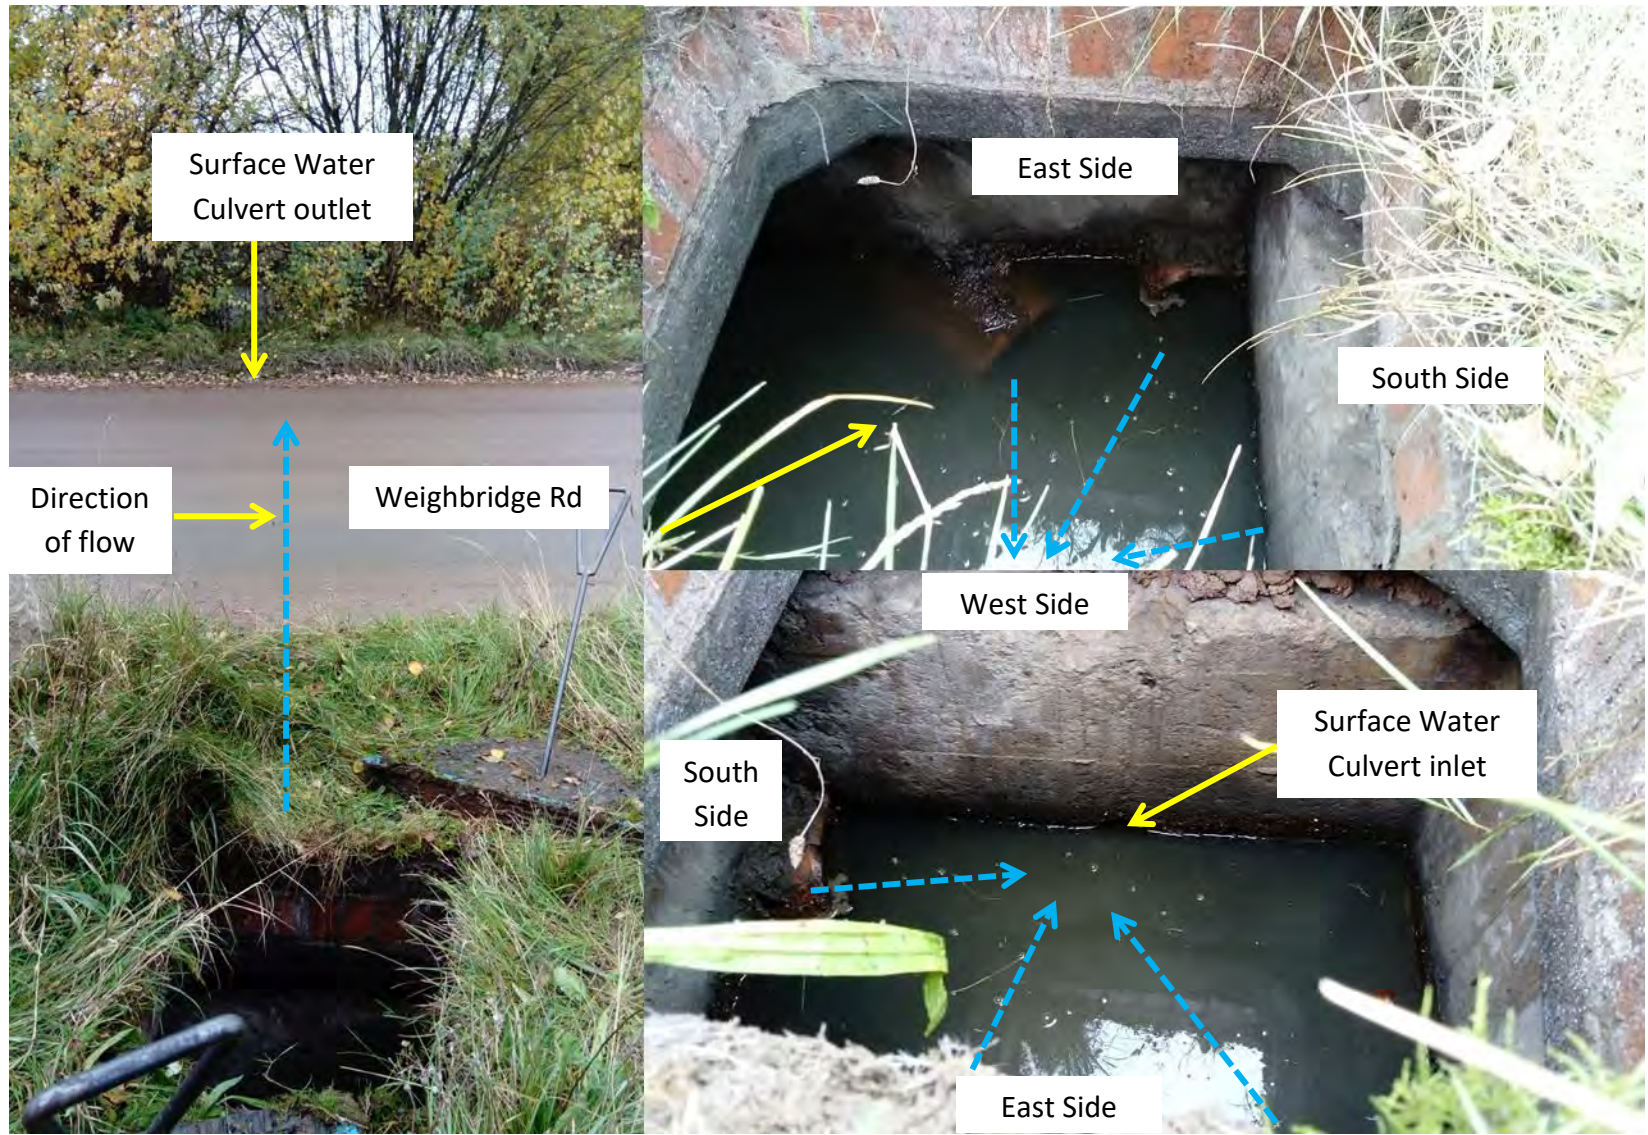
Surface water drainage in adjacent to site access ramp. Manhole receiving surface water from the east and proceeding westwards towards the site entrance.
